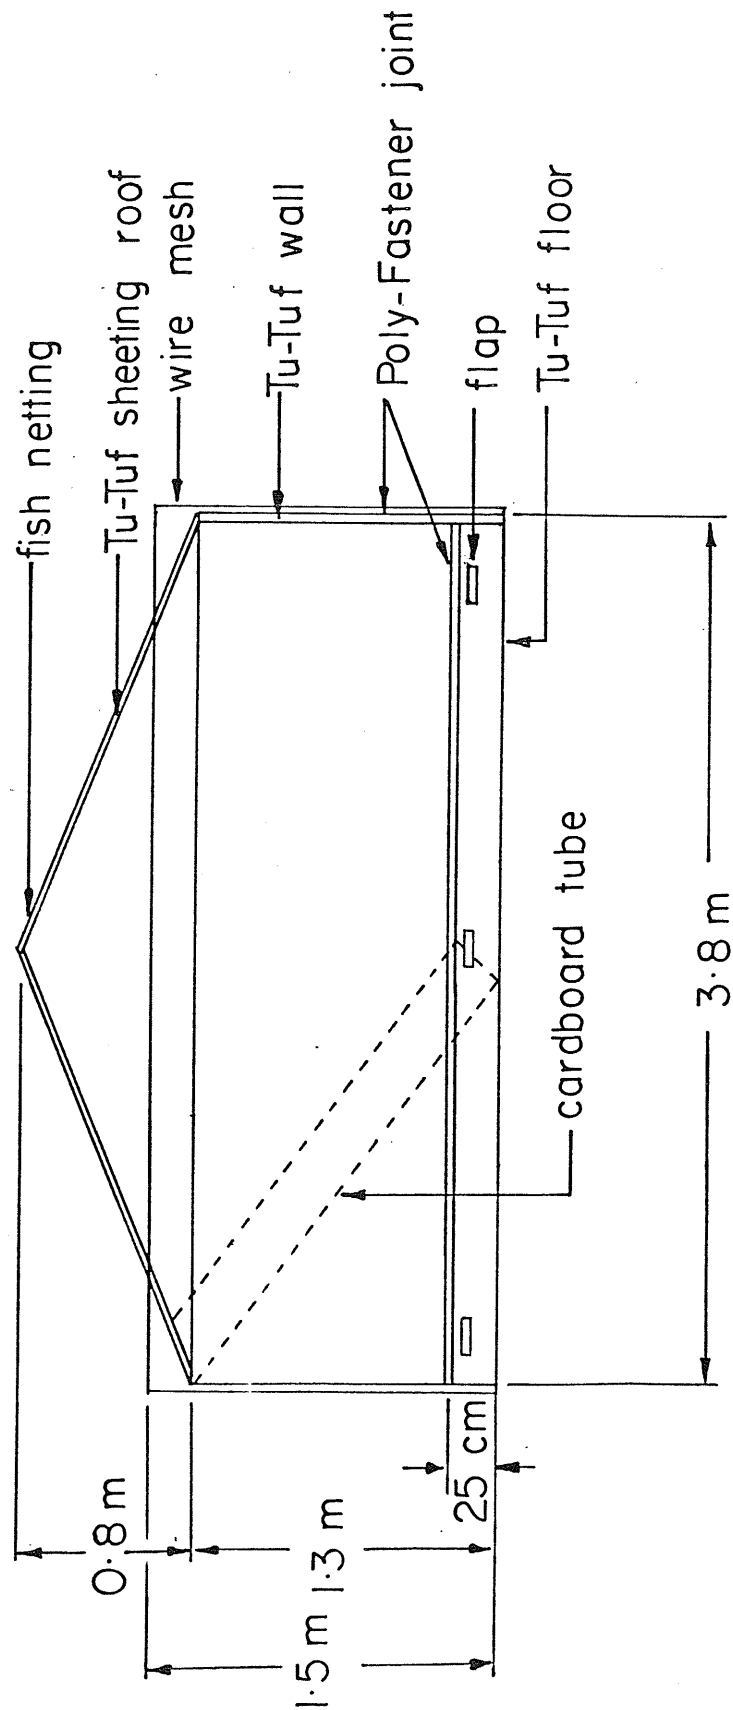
Cylindrical bin with Tu-Tuf wall and conical roof.
